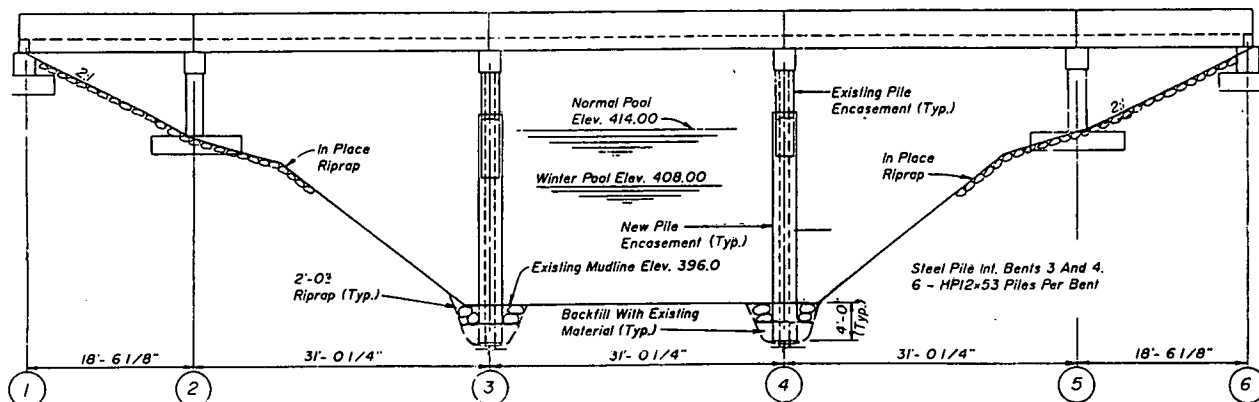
Scour repair of jacketed piles using riprap. (From Mississippi DOT plan).
